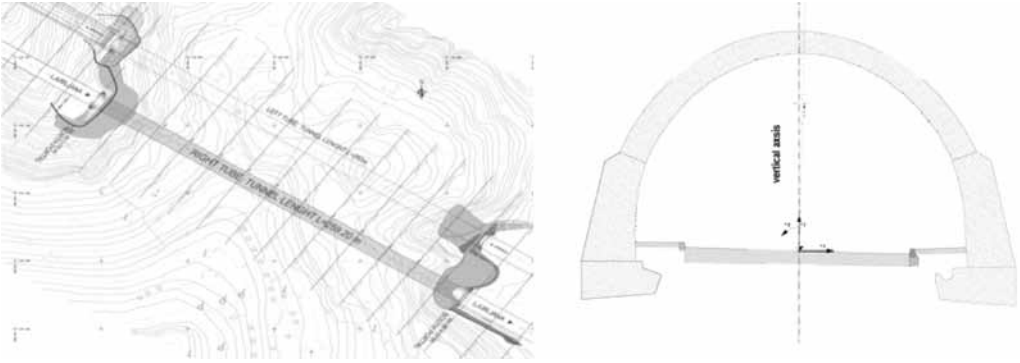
Location of the reconstructed right tunnel tube and cross-section of the right tunnel tube before reconstruction.
